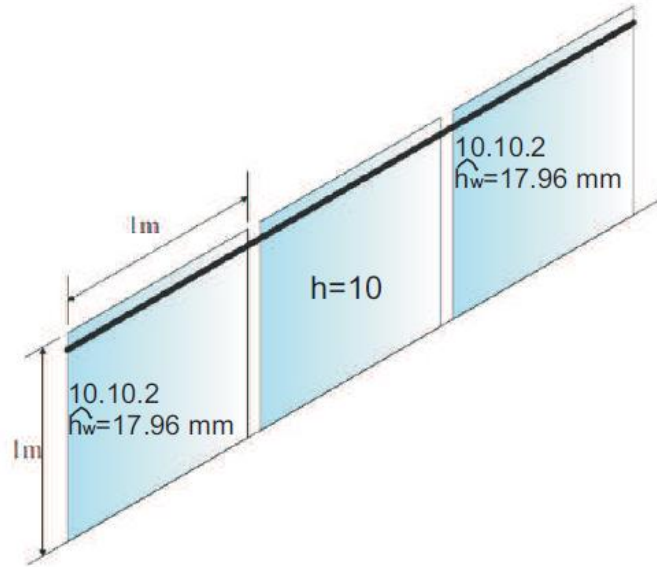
Parapet with damaged element, and with handrail that distributes the load to the adjacent elements.
